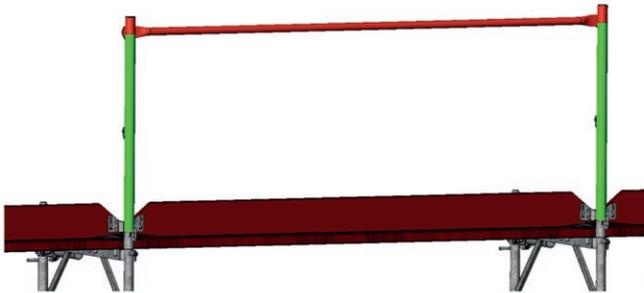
Permissible anchorage points for the personal protective equipment on the guardrail post with transom
